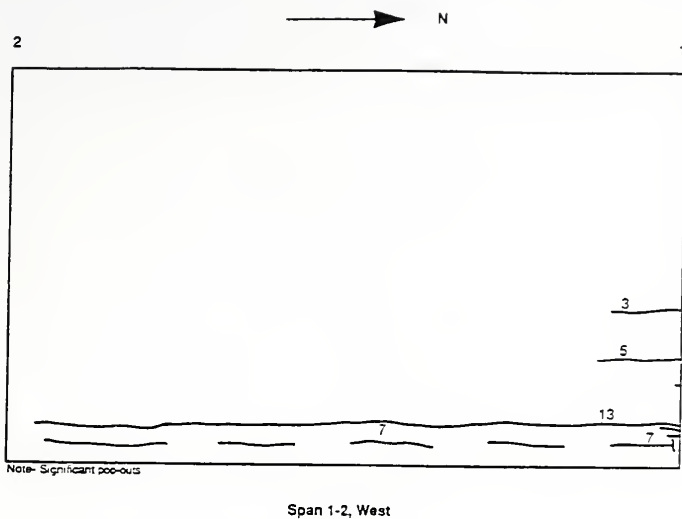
Crack Patterns, Bridge # 7-40-6527
